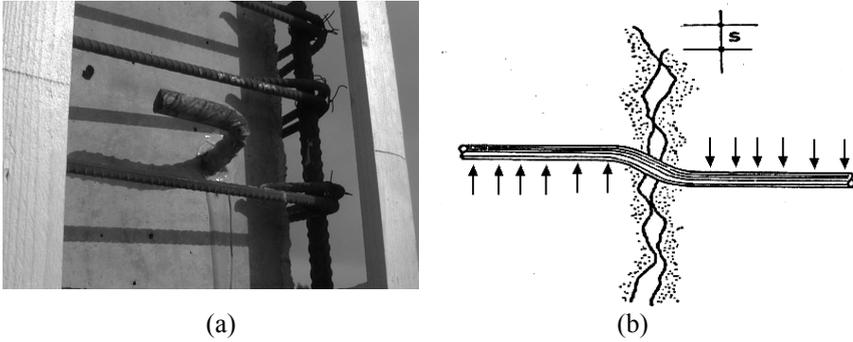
(a) Use of dowels in concrete jackets, (b) Dowel action.
